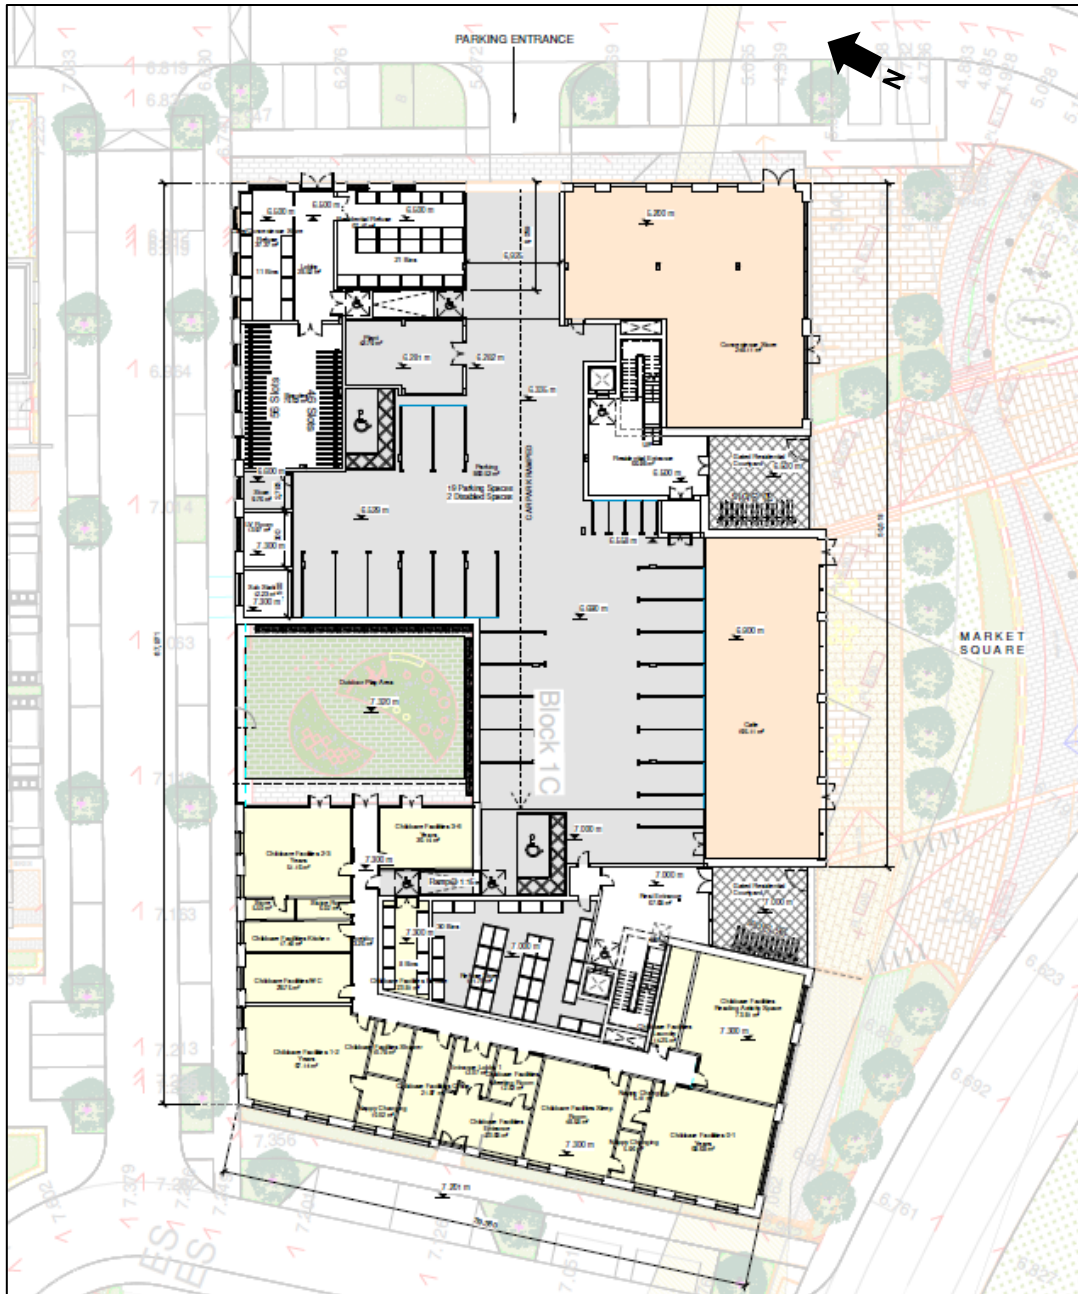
Block C ground floor plan permitted under ABP-311181-21.
